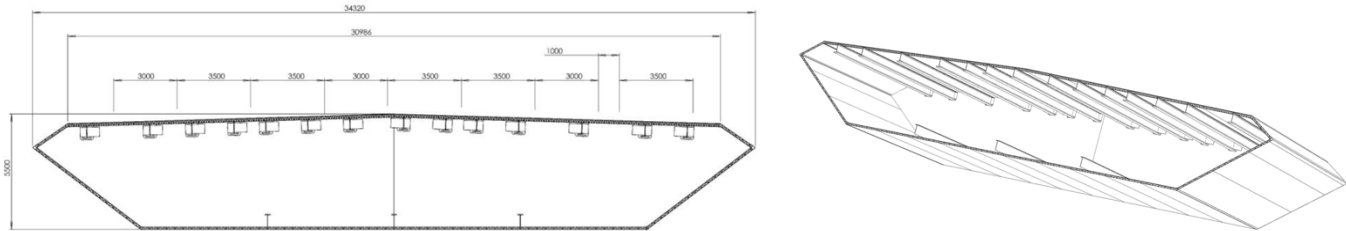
The cross section and 3D image of the panel concept bridge girder (Olav Olsen, 2019).
